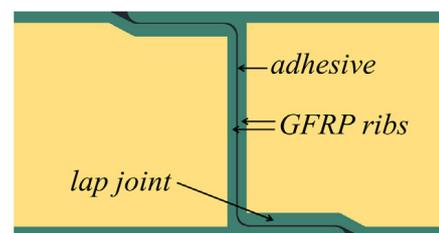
Detail of a Z-shaped adhesively bonded panel-to-panel connection [5].
